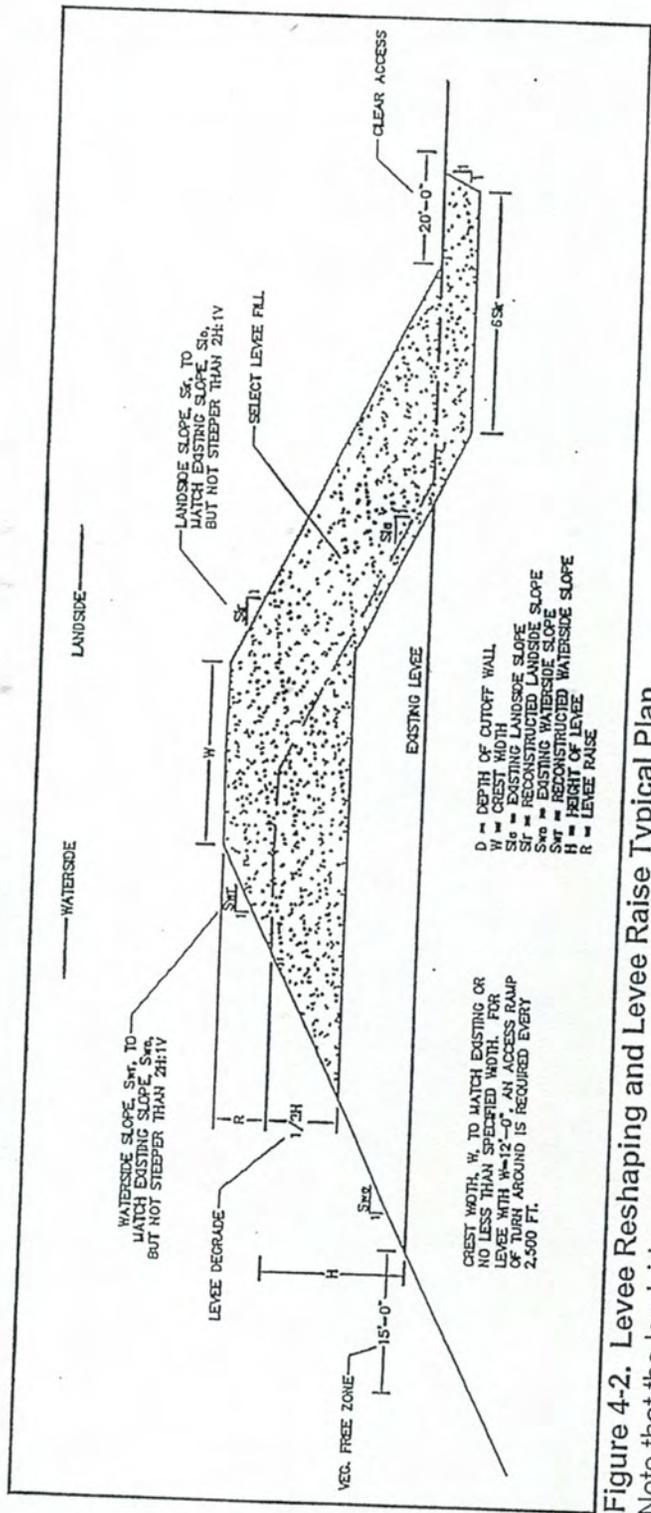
Levee Reshaping and Levee Raise Typical Plan.
